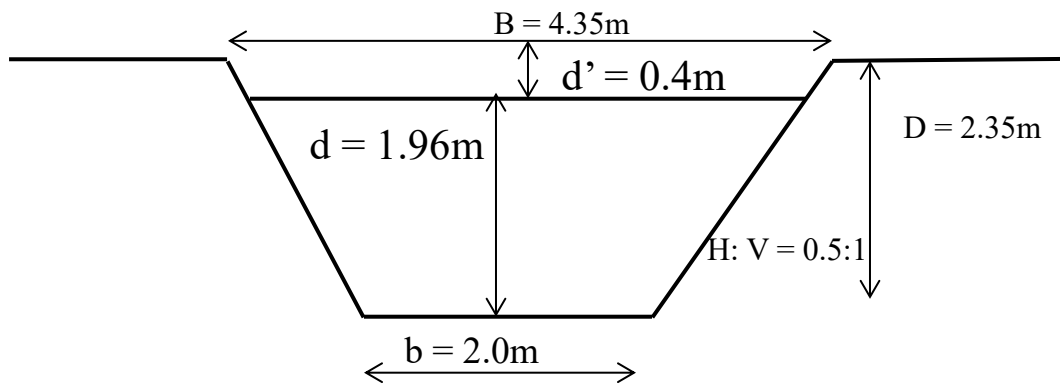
Layout of trapezoidal canal of common outlet canal
